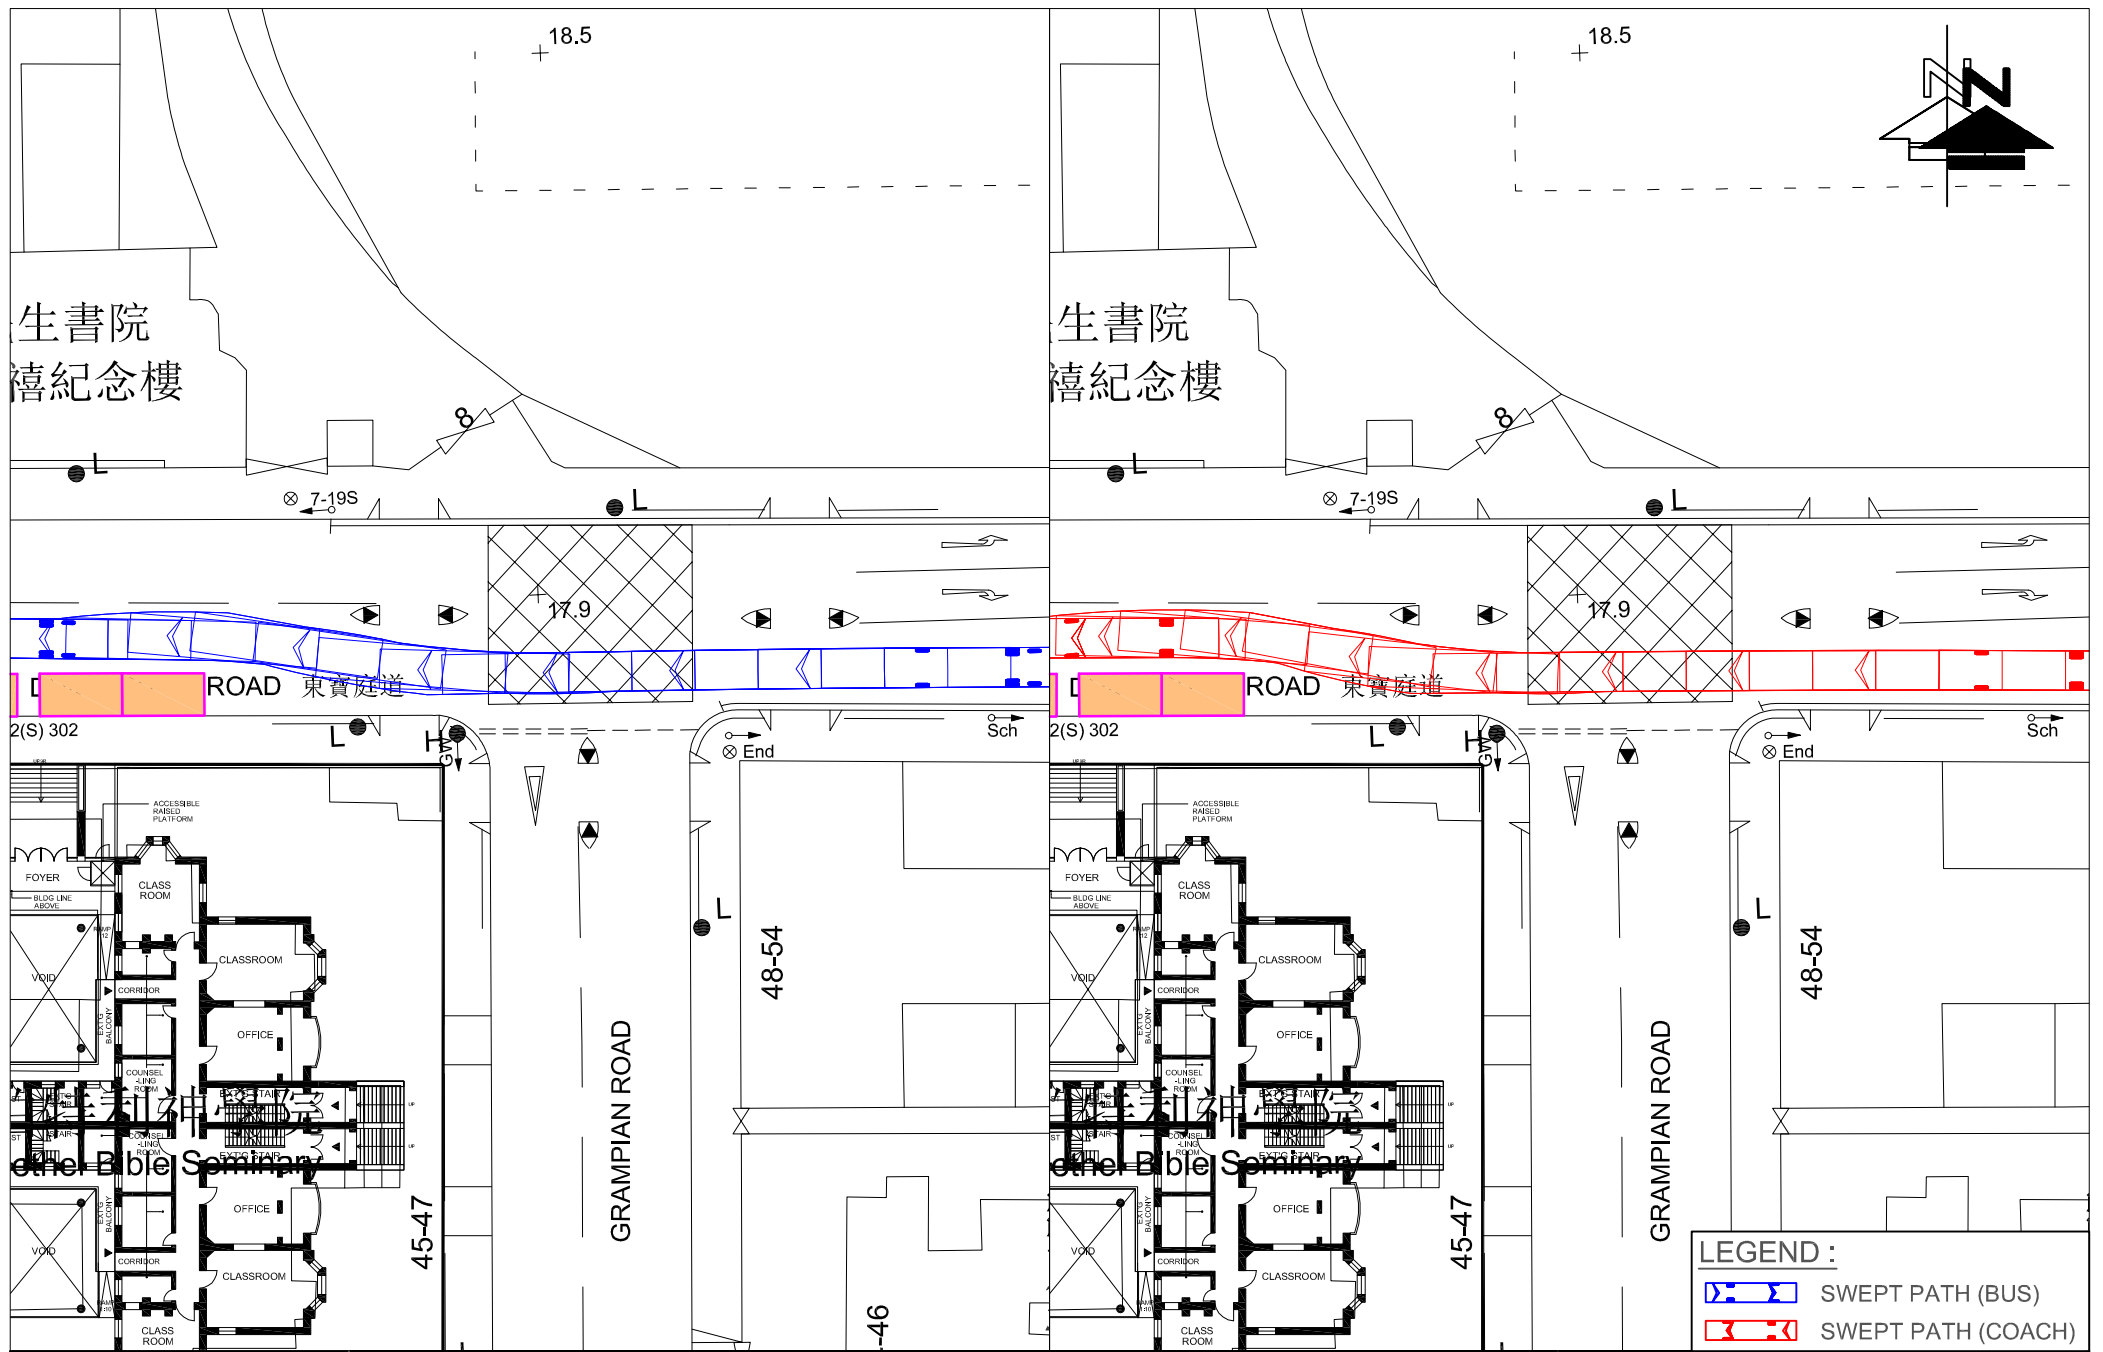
PROJECT TITLE:	Bethel Bible Seminary at 45-47 Grampian Road, Kowloon City (NKIL 1382) Planning Application
